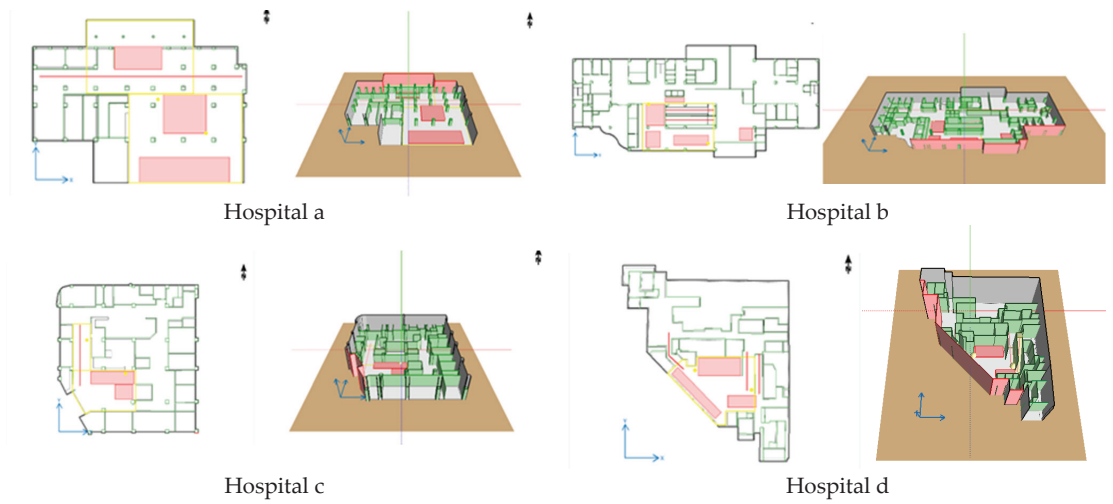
Four hospital plans and 3D models in SoundPLAN.
